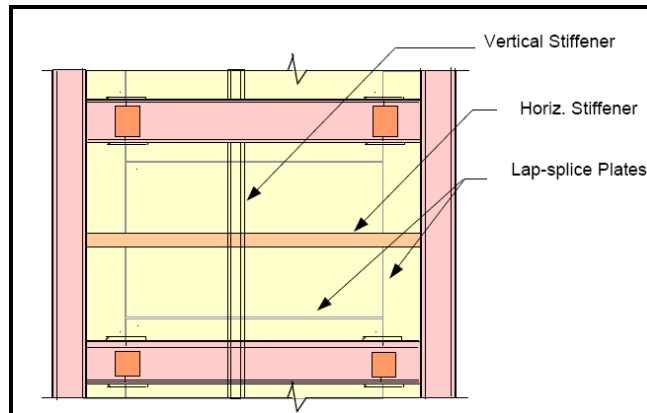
Details of steel shear walls used in Nippon Steel Building
